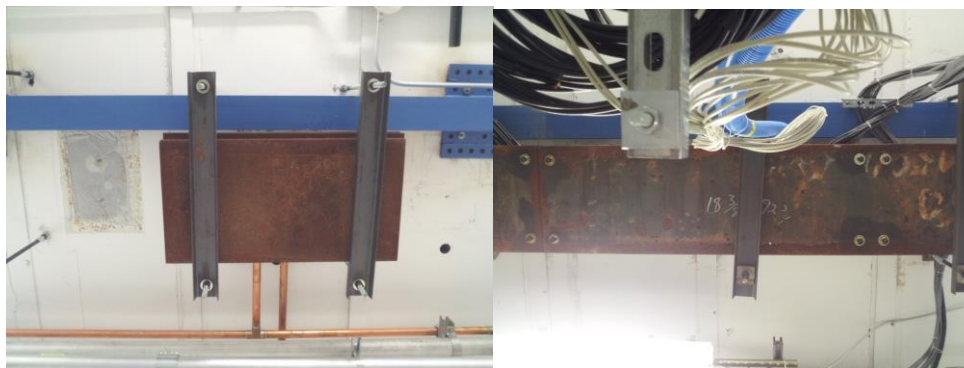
Steel plates covering penetrations in Cave 1. Cables pass through the penetrations linking the electronics racks and the new gun. Specifically, cables for the gun chamber ion pump and RadMon radiation detectors.
